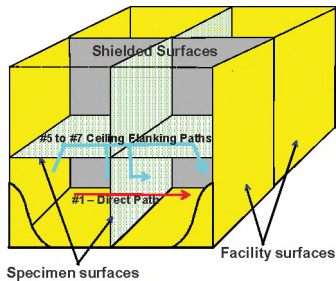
TL of ceiling-ceiling, wall-ceiling, ceiling-wall and direct path between two rooms separated by a party wall.
